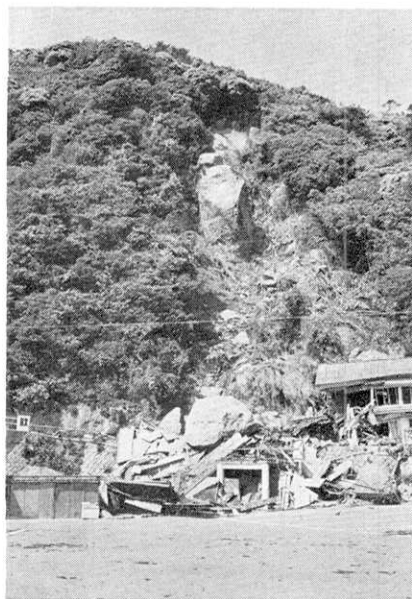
Collapse of a house by the falling stones at Irozaki.
